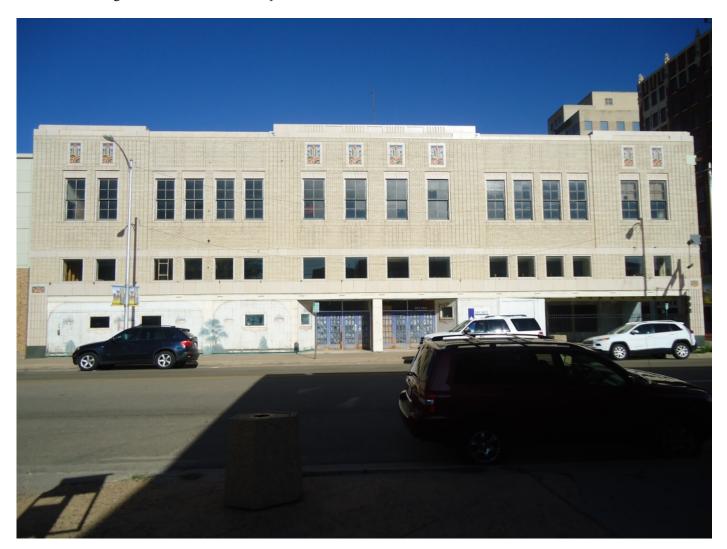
Building Exterior – Polk Street and 8th Street Facades
